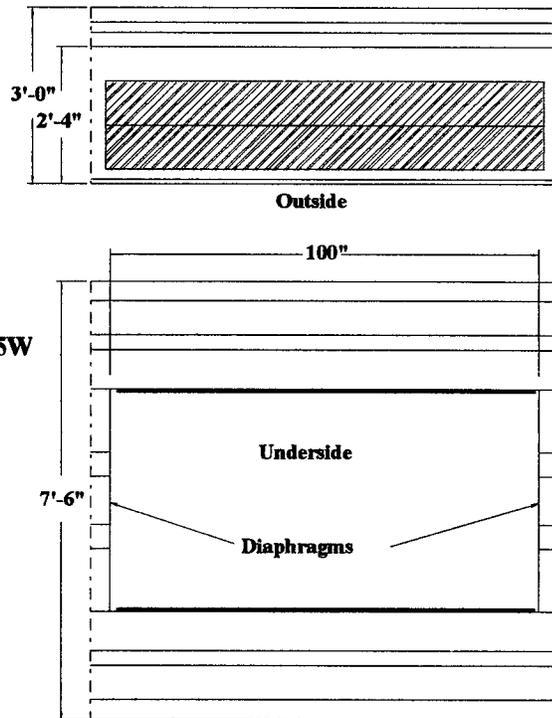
Layout of zinc/hydrogel on beams #4 and #5.
